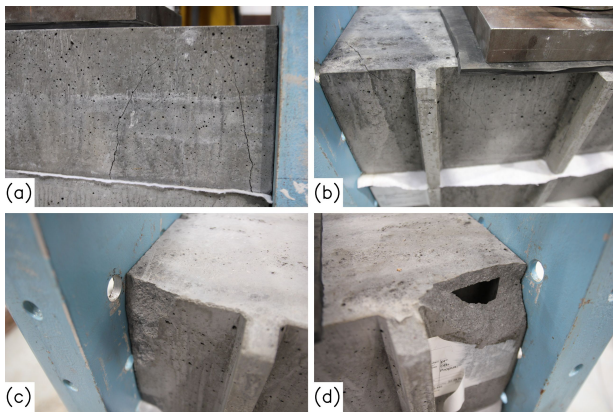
Pre-cracks visible to the naked eye in the upper blocks of side columns with side supports: two horizontal cracks in the front face of the first tested sample (a), cracked right rear corner of the second tested sample (b), cracked right rear corner of the third tested sample (c), and cracked left rear corner of the third tested sample (d).
